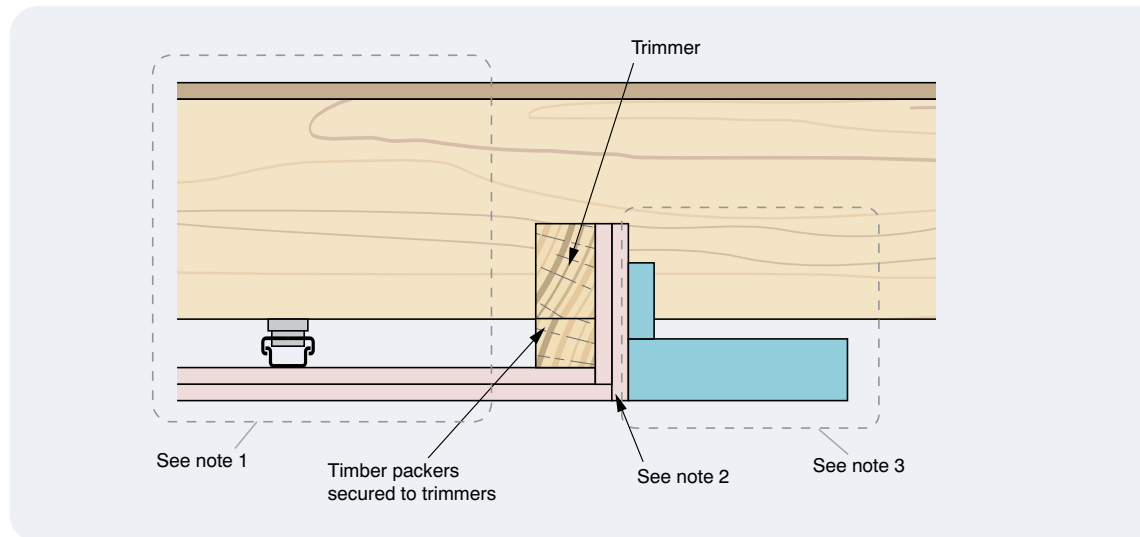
Access panel in a fire-protected floor/ceiling system.
